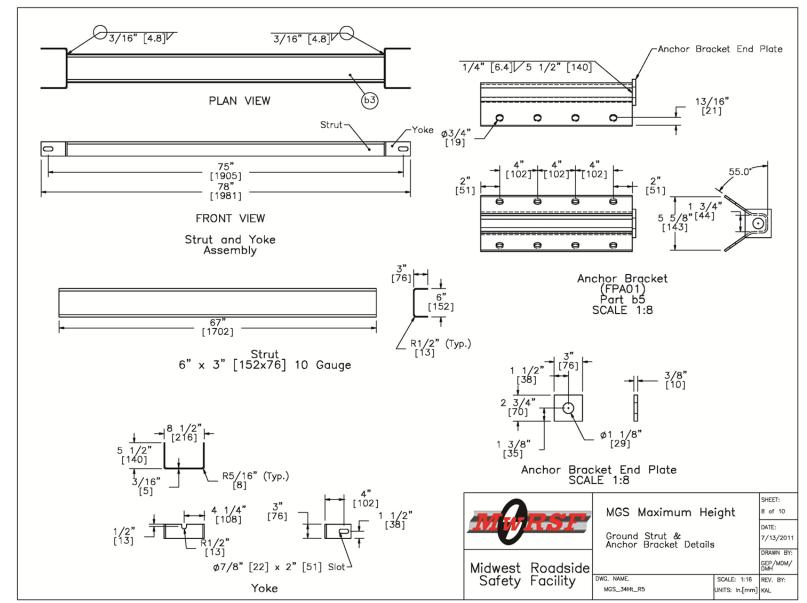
Ground Strut and Anchor Bracket Details, Test No. MGSMRH-1
